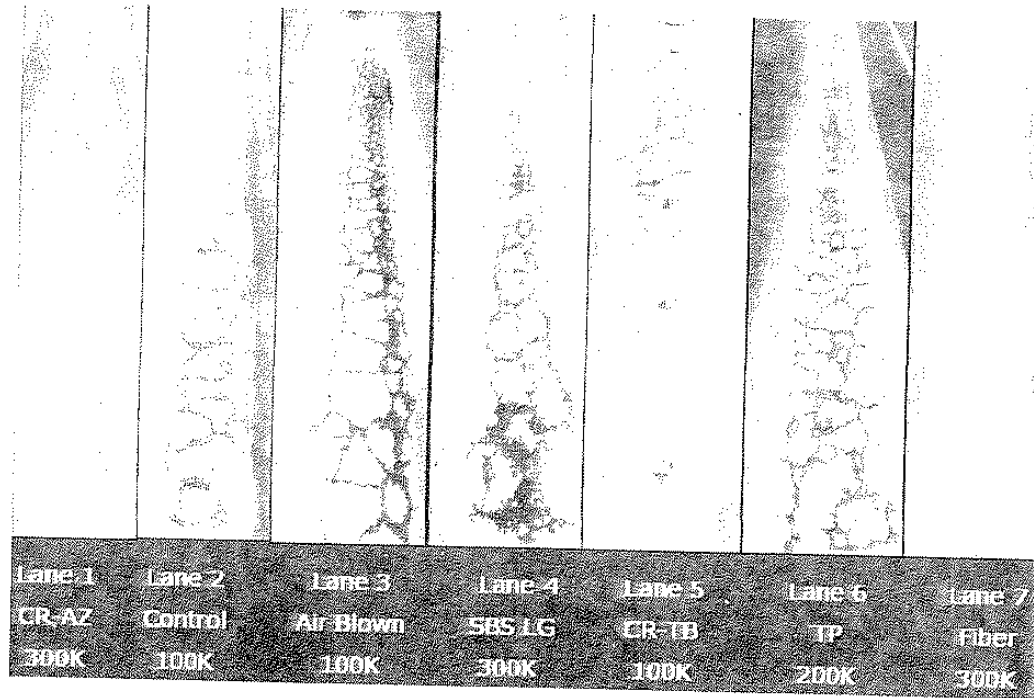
Pavement Cracking conditions at end of fatigue testing at 19 °C and 74 kN
